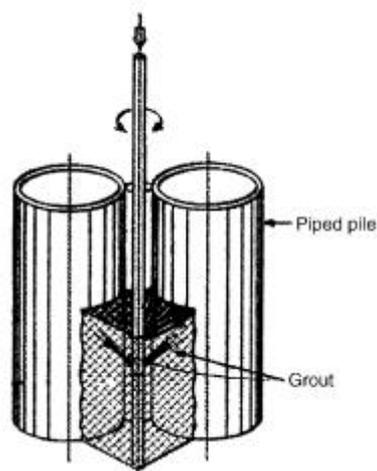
Jet grout sealing between piles (Moseley, M., P. and Kirsch., K., 2004)
